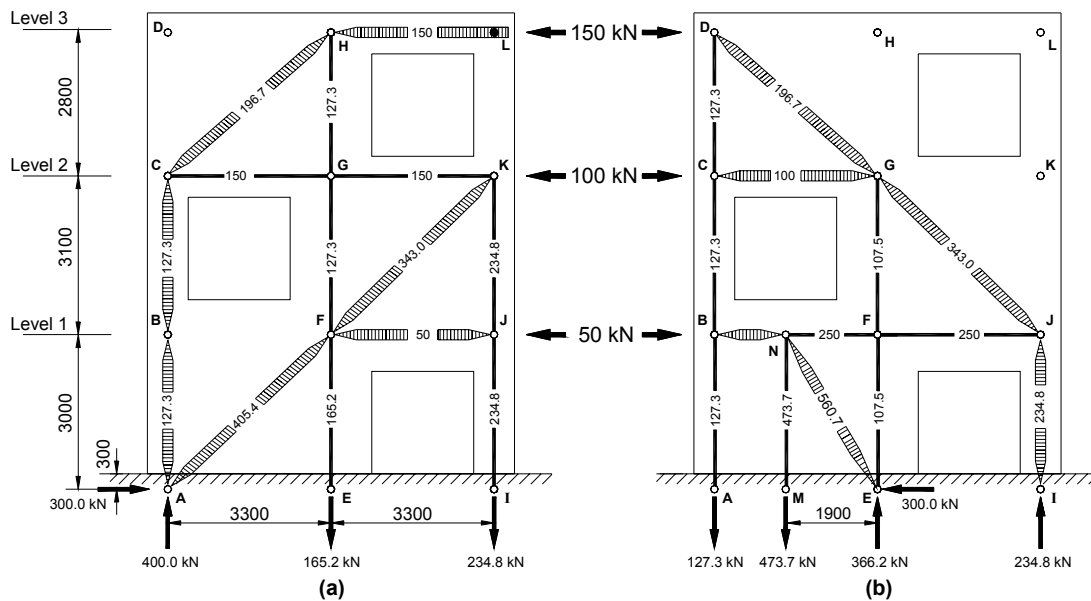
Strut-and-Tie Models for Masonry Wall (seismic loading only)
